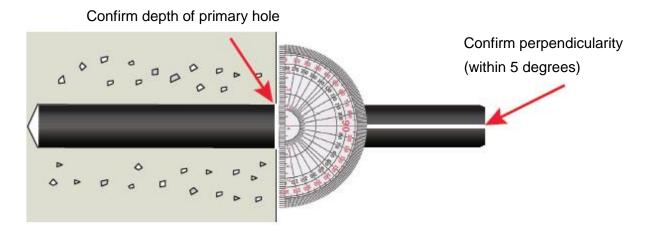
Confirming depth and perpendicularity of primary hole (Pre-setting type)
